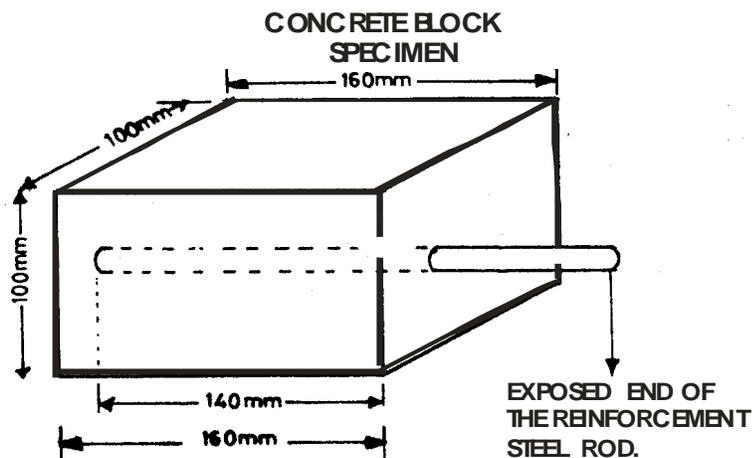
Concrete block specimen showing the arrangement of reinforcing steel.
